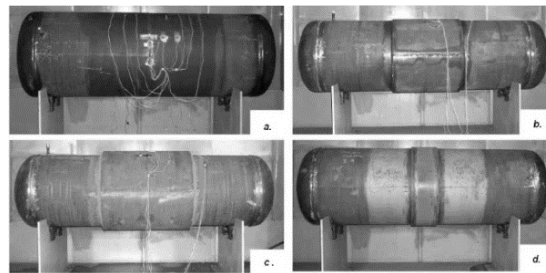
Piping test pieces prepared for internal pressure testing [3] a. pipe sample with an external surface defect; b. pipe sample with external local surface defect repaired; c. Pipe sample with external local surface defect repaired by application of a coating filled with epoxy resin; d. Pipe sample with local surface defect repaired.
